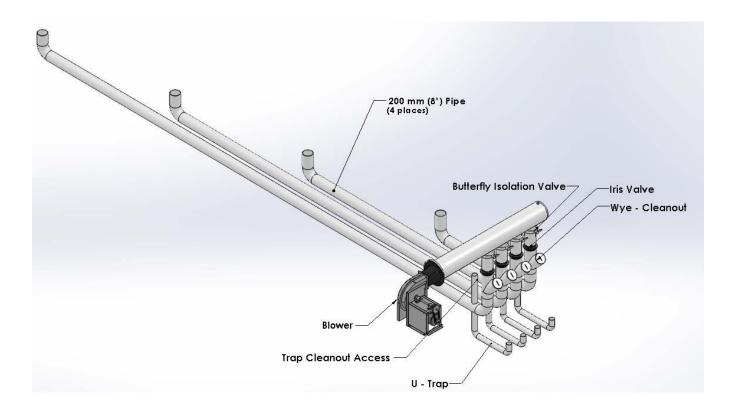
Typical Bay Aeration Piping Arrangement (as shown for 4 bays)
